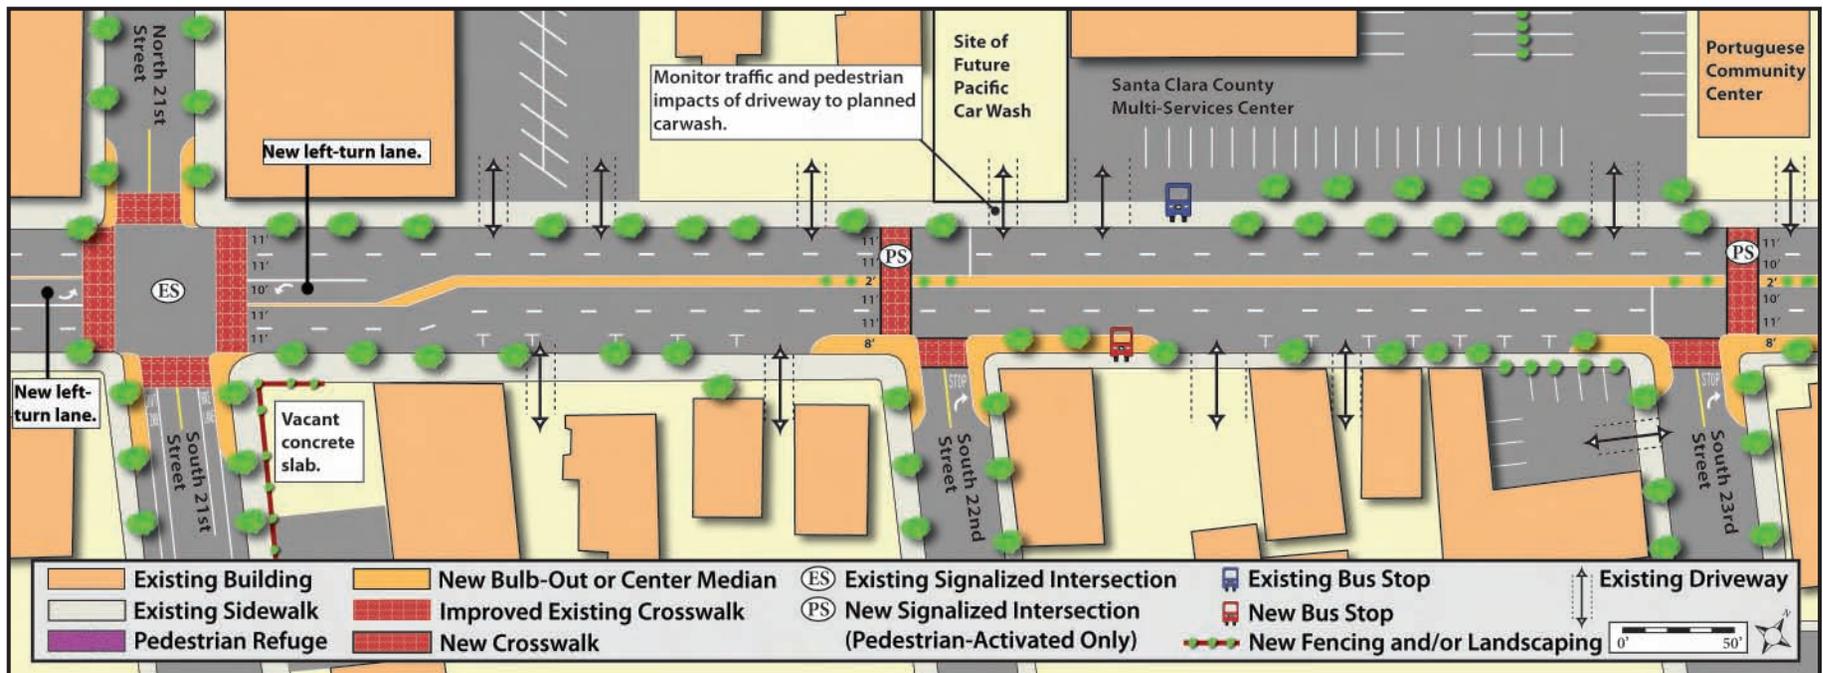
East Santa Clara Street/Alum Rock Avenue - Segment #2.
